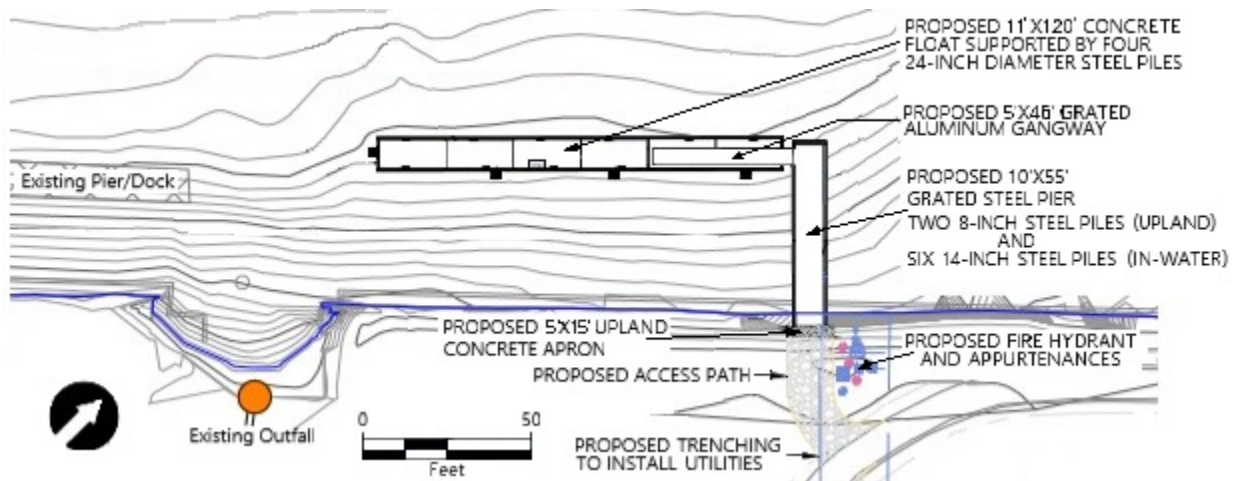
The proposed pier, ramp, and float (Adapted from Sheet 3 of 7 in Anchor 2019).
